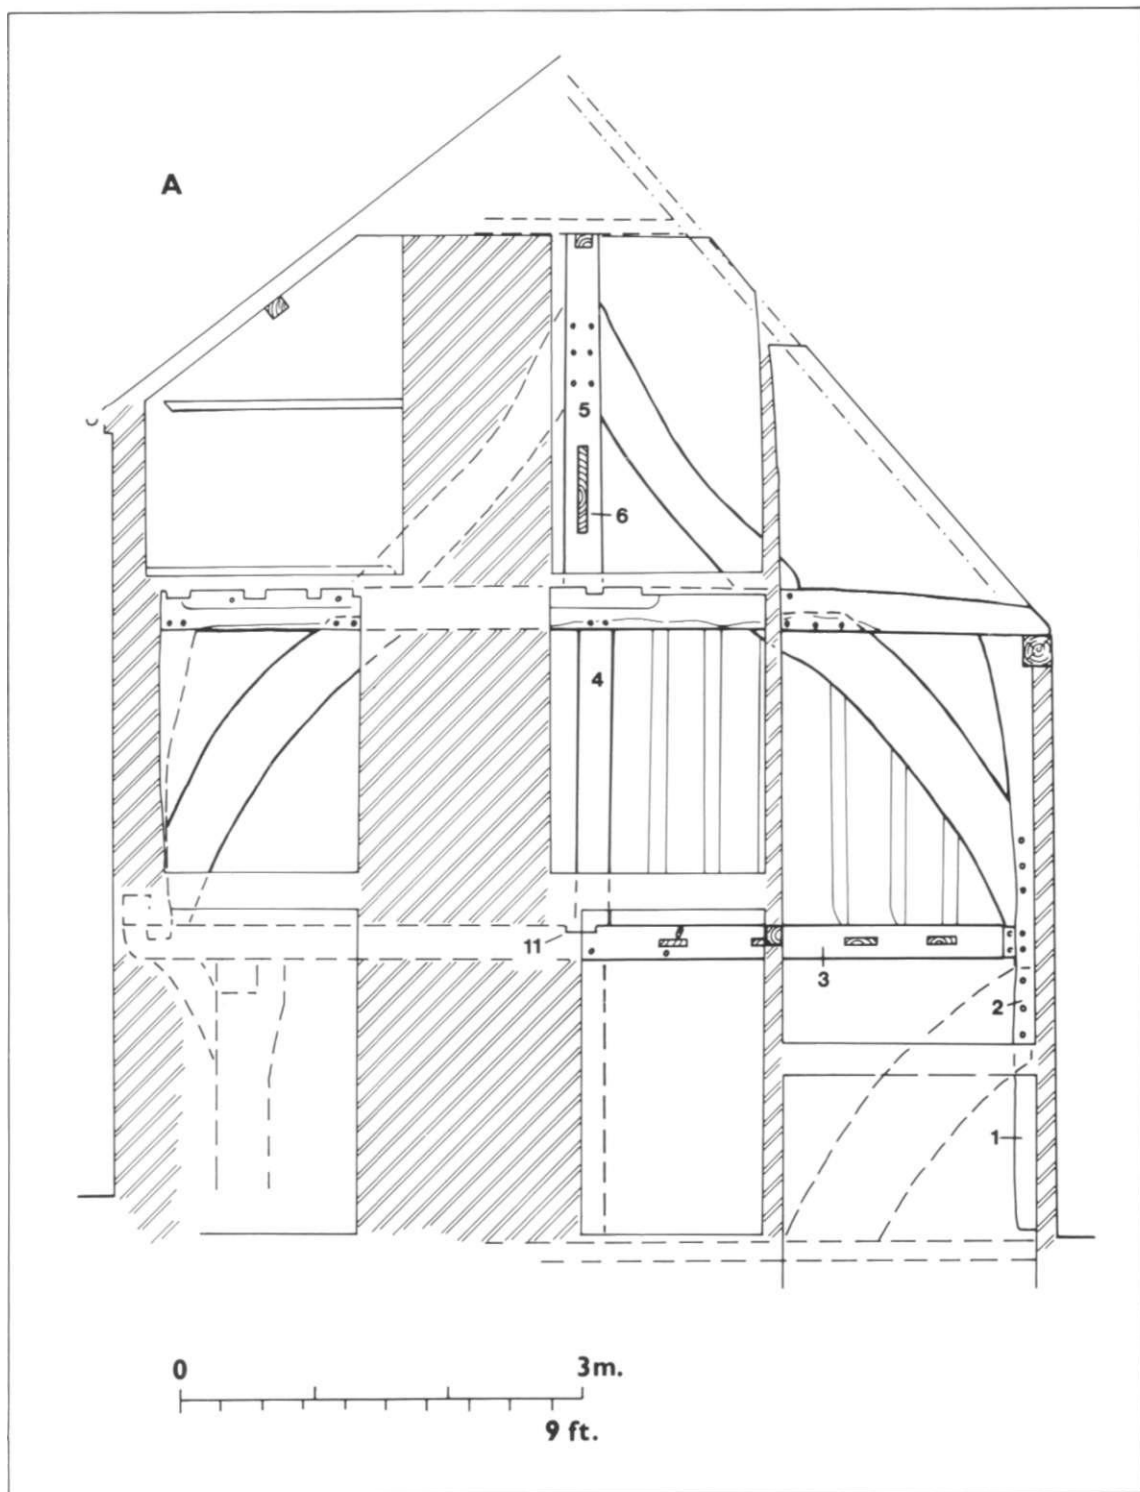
West gable wall of 186, Horninglow Street: truss A.
